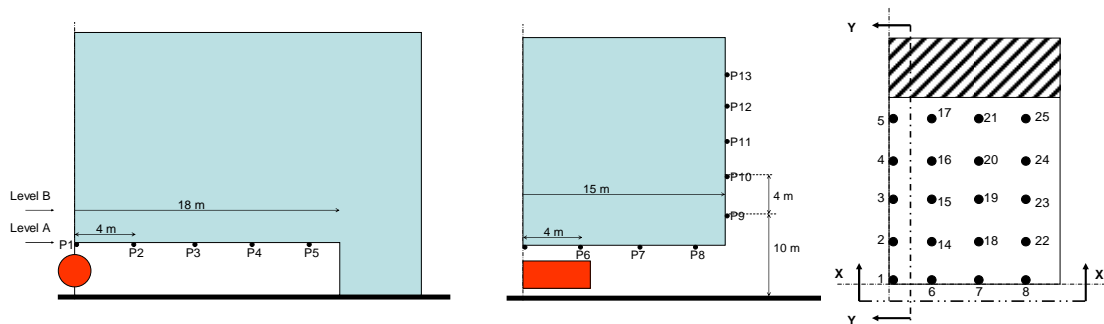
The geometric model of the building in two vertical cross-sections (X-X), (Y-Y) and the horizontal section at level A with target points.
